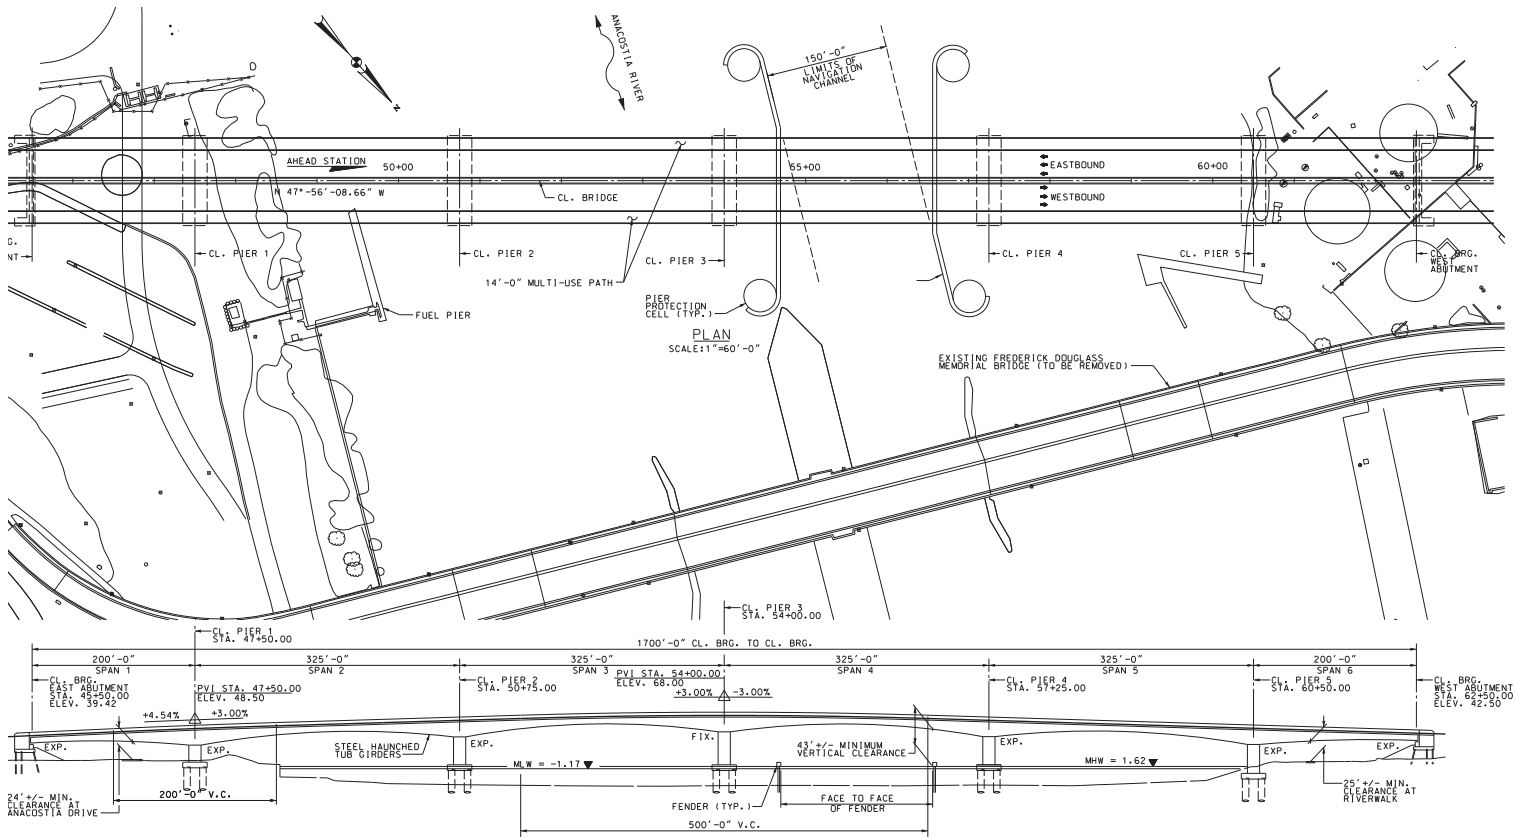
Bridge Alternative 3 - Plan and Elevation
